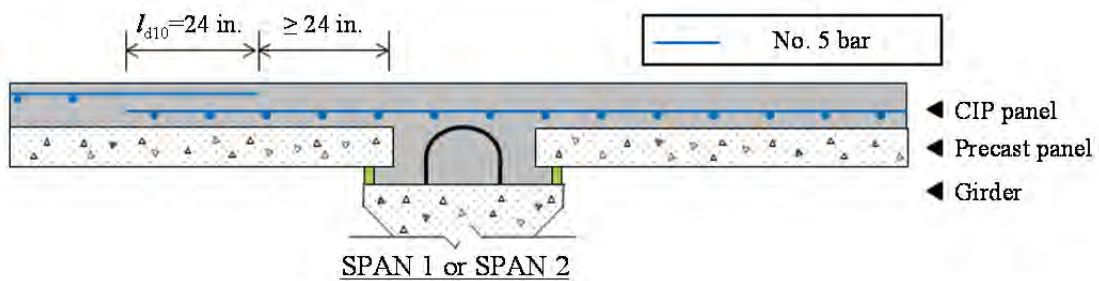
Details of transverse splice, Lampasas River Bridge (Section M-M)
